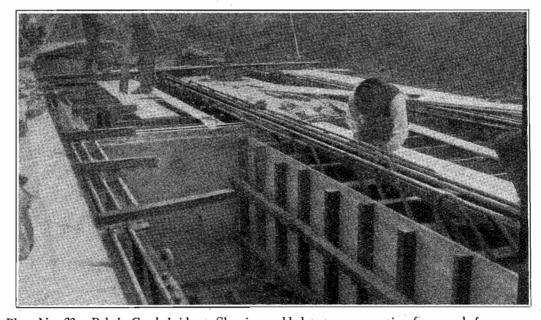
Pyke's Creek bridge. Showing welded trusses supporting framework for concrete.
